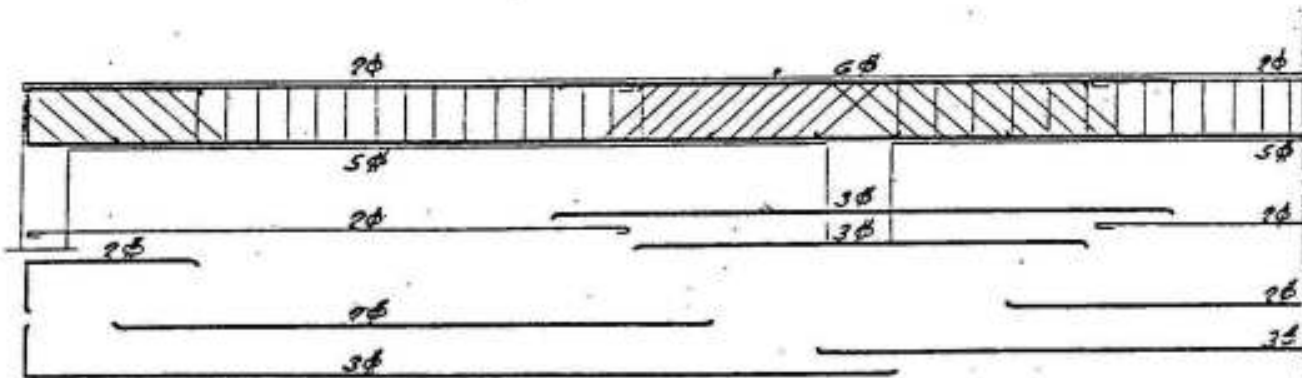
Use of straight steel bars and inclined stirrups in continuous girders
